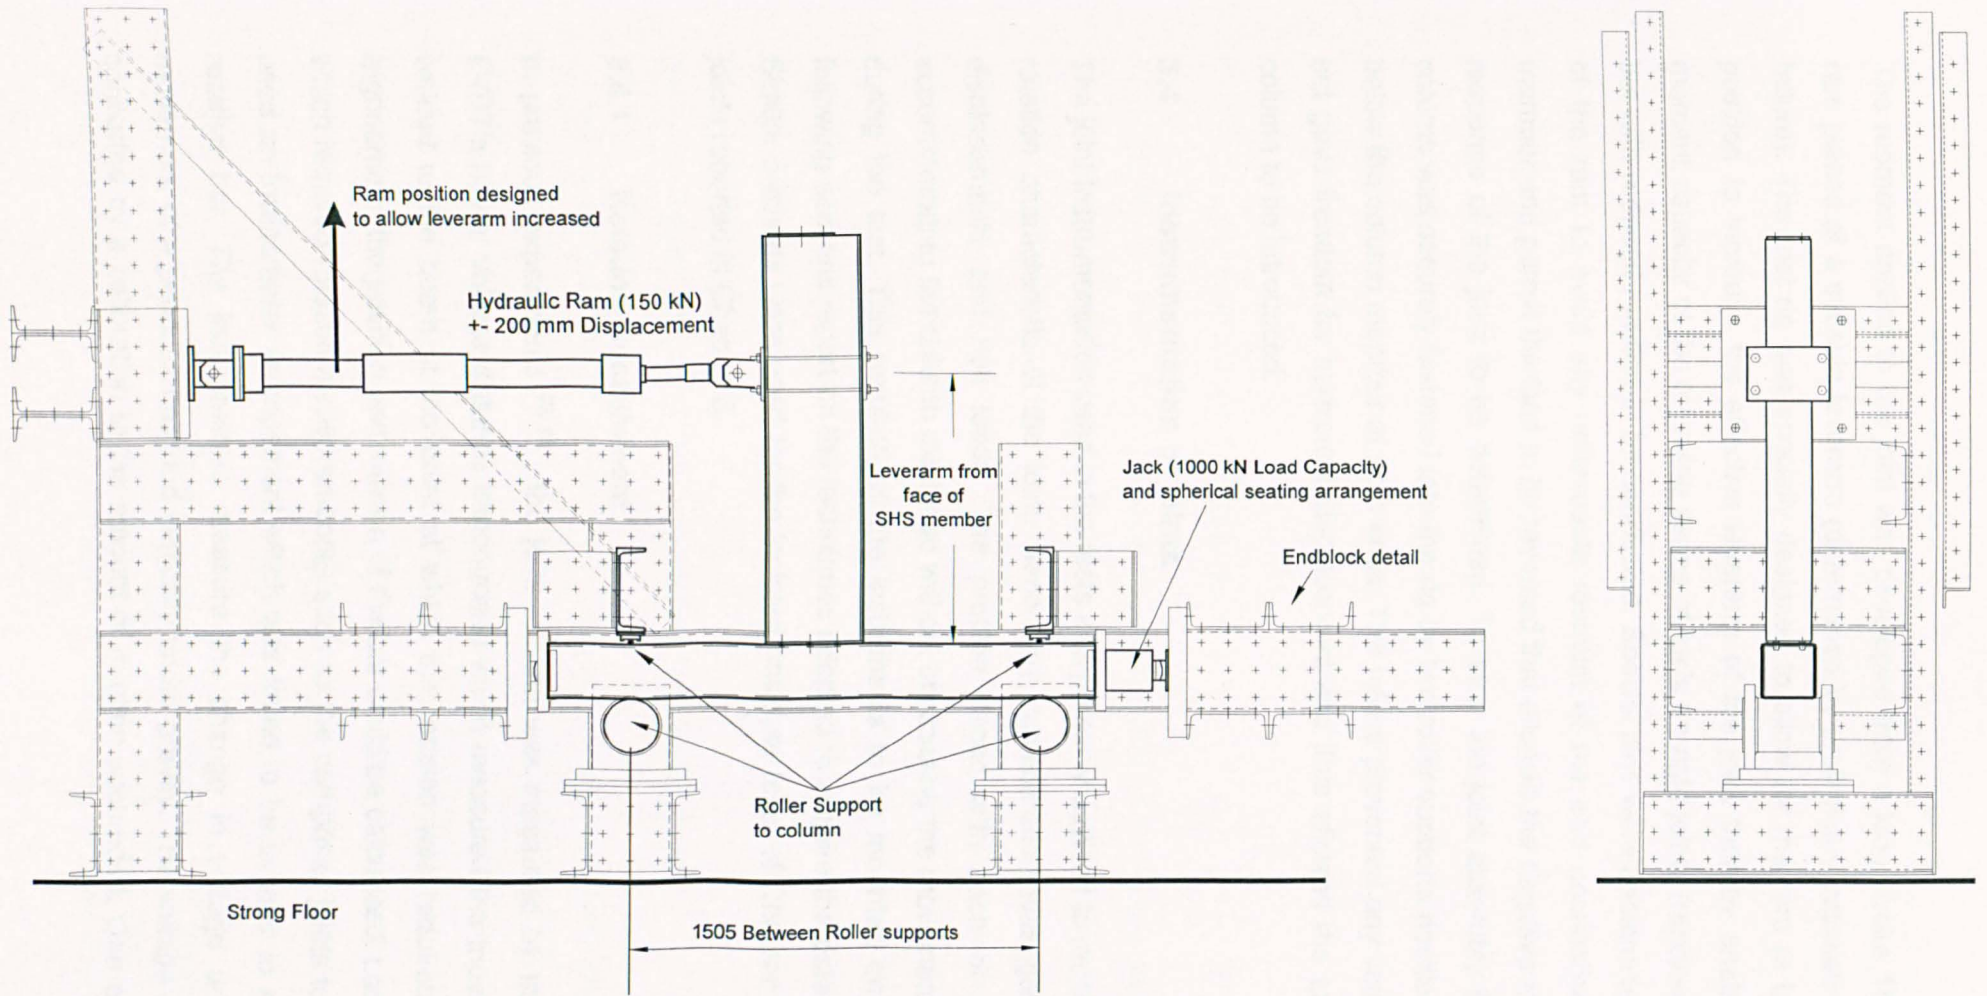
Details of test rig and joint arrangement for Simple Flowdrill joint tests
